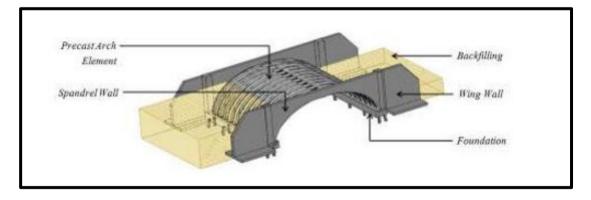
Main Component of Precast Concrete Closed Spandrel Arch Bridge (Ong et al., 2015)
